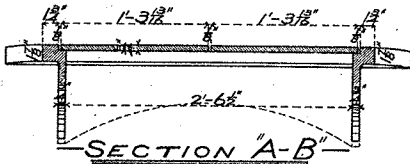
## DETAILS OF CASTINGS FOR NO. 2 AND NO. 3 OPEN MOUTH INLETS
